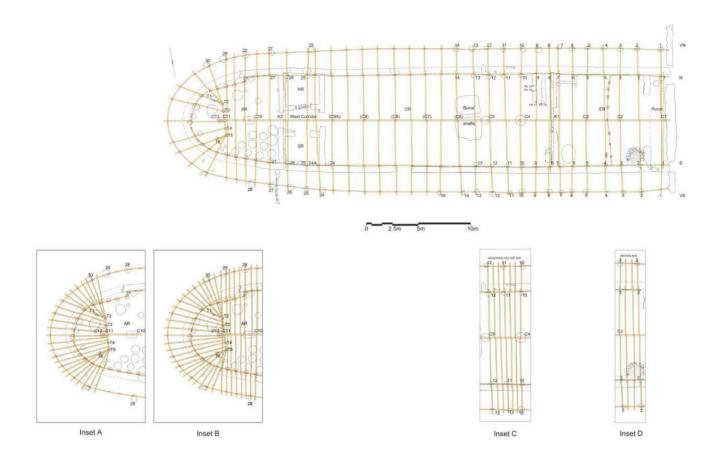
RECONSTRUCTED PLAN OF THE ROOF WITH PRINCIPAL RAFTERS (IN BROWN) SUPERIMPOSED ON THE EXISTING PLAN (IN BLACK). INSETS A-D: PRINCIPAL AND COMMON RAFTERS IN THREE DIFFERENT PARTS OF THE BUILDING.
